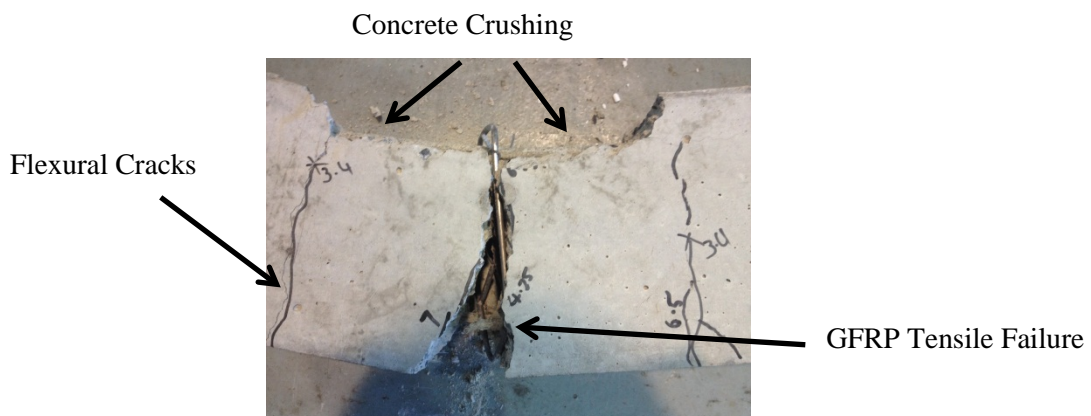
Concrete Crushing and GFRP Tensile Failure (Balanced) of Beam 40-#2S-0.5-S
